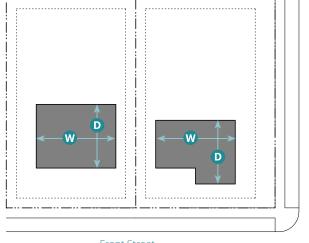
Determining the Required Amount Subject to the Facade Zone
